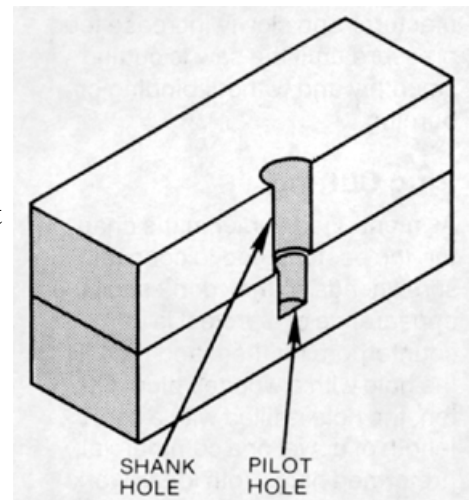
A screw usually requires a shank hole for the shank and a pilot hole for the thread. The shank hole should equal the gauge of the screw and go through the first piece. The pilot hole should be half the length of the threaded portion of the screw.
